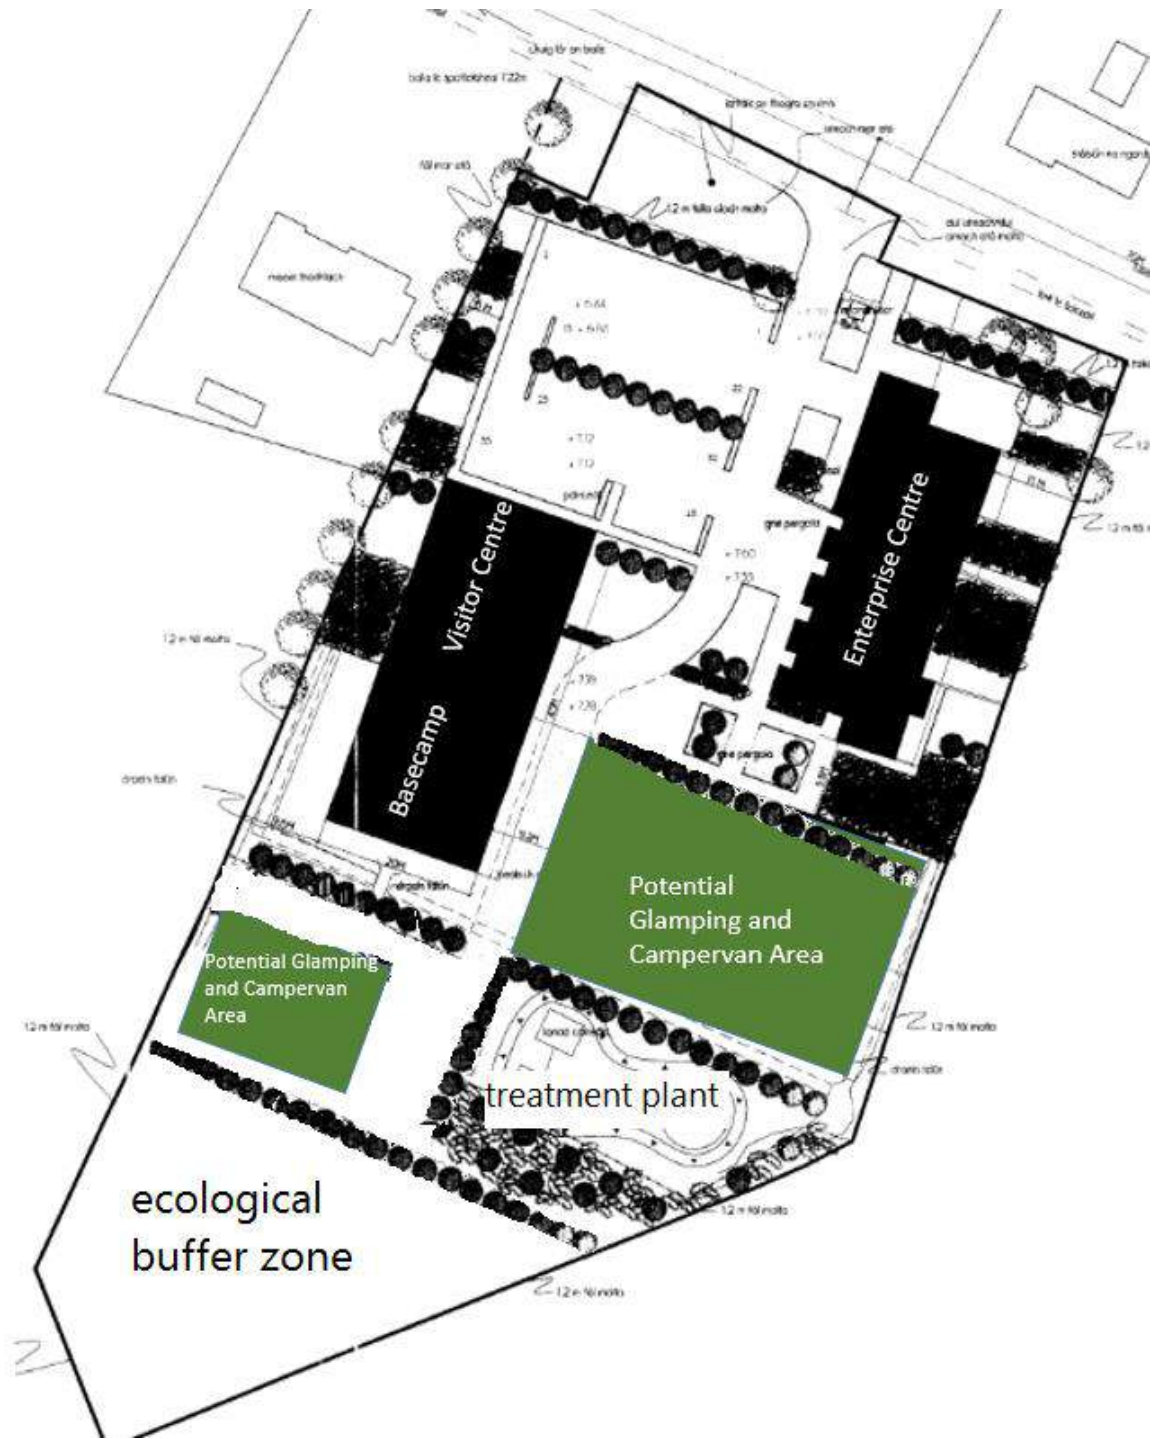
Potential layout for master site plan on the Údarás na Gaeltachta Site
